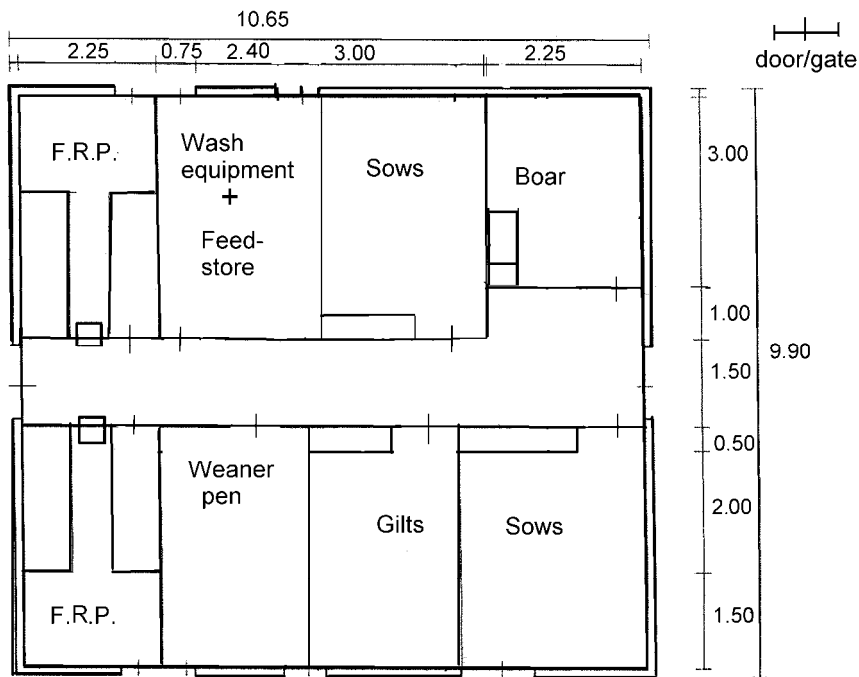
Layout of a 5 sow unit, FRP = Farrowing and rearing pen
